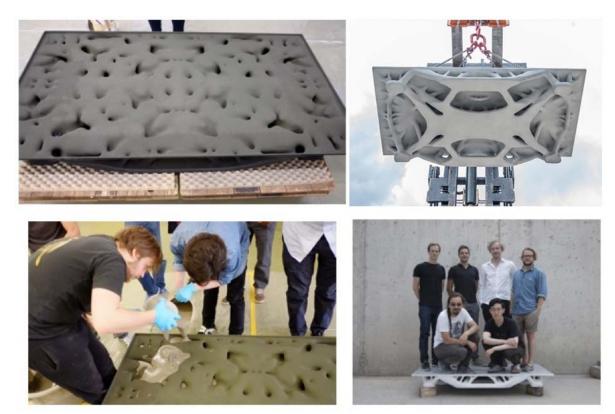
Top view of element, pre infill (top left); Bottom view of element, post infill (top right); Infill process (bottom left); Final element after casting (bottom right)
